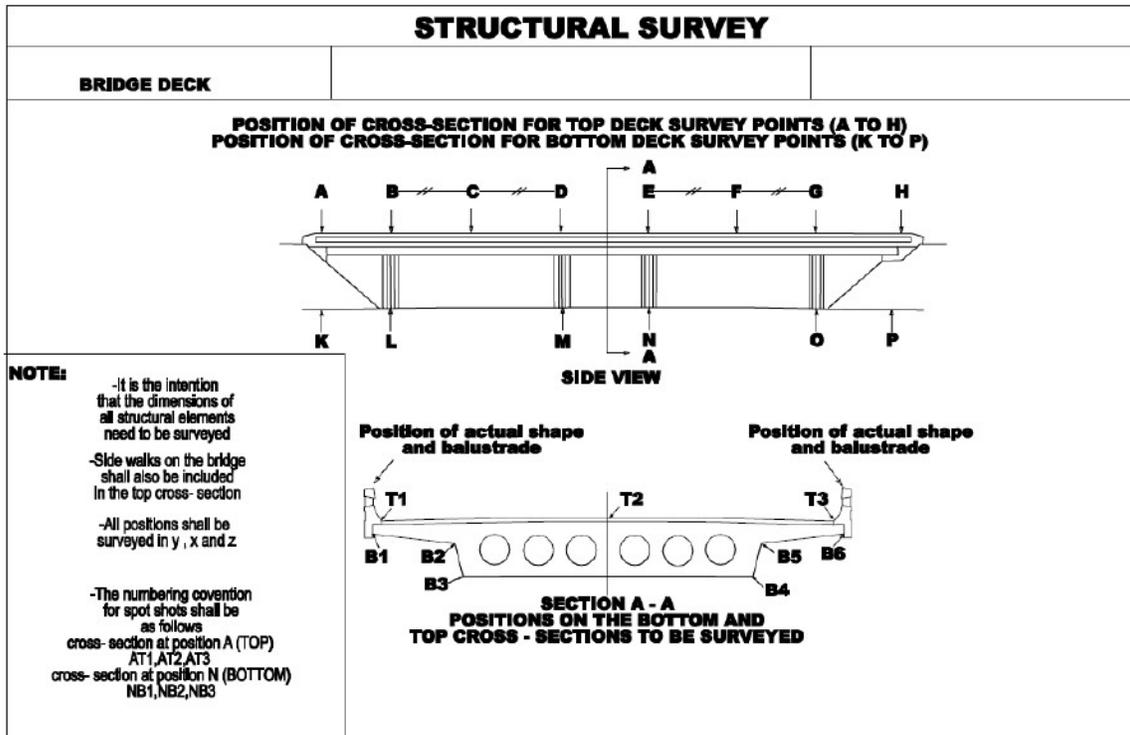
Position of cross section for top and bottom deck survey points (Bridge deck)
